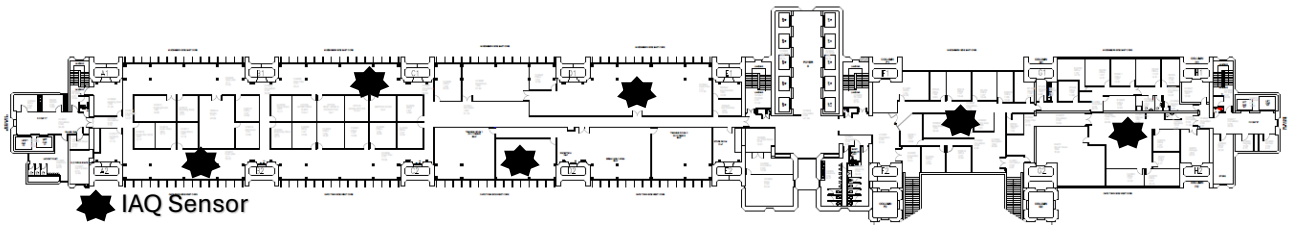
Tower Building proposed sensor positioning 3rd floor (6)
